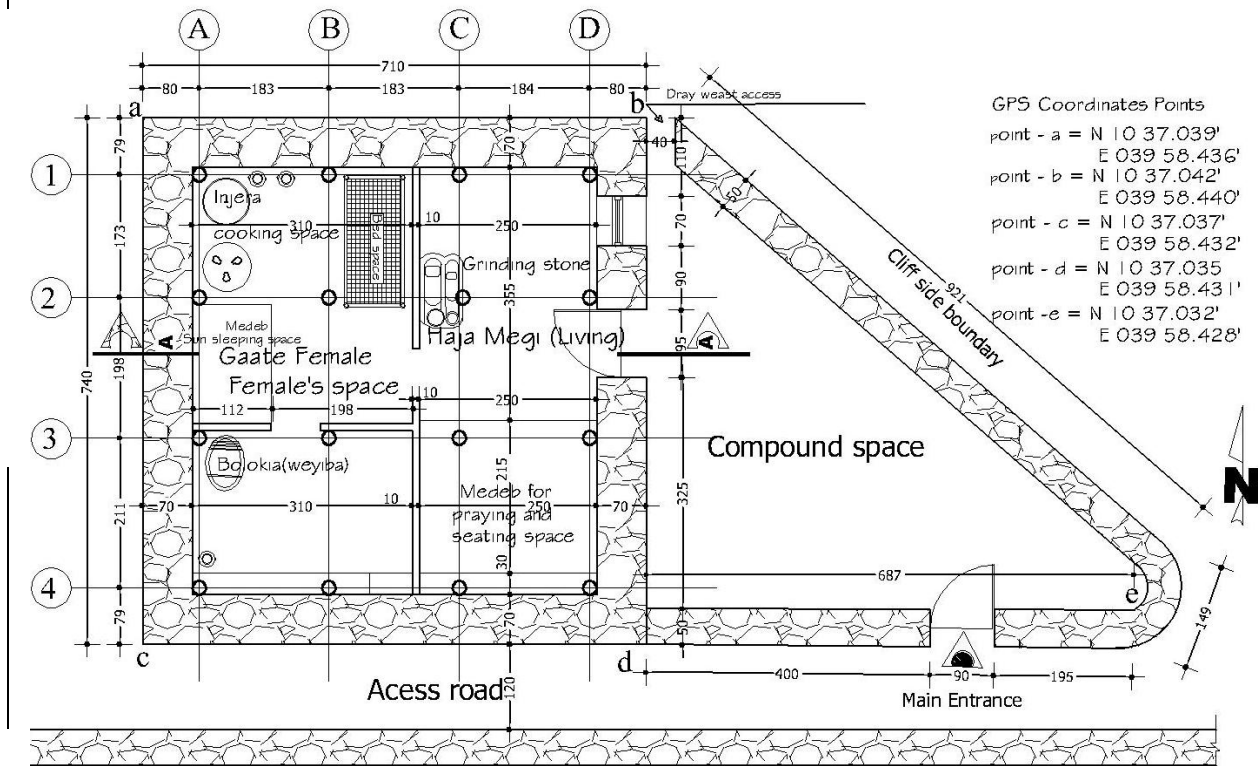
92 Compound lay out and floor plan of W/ro Merema
